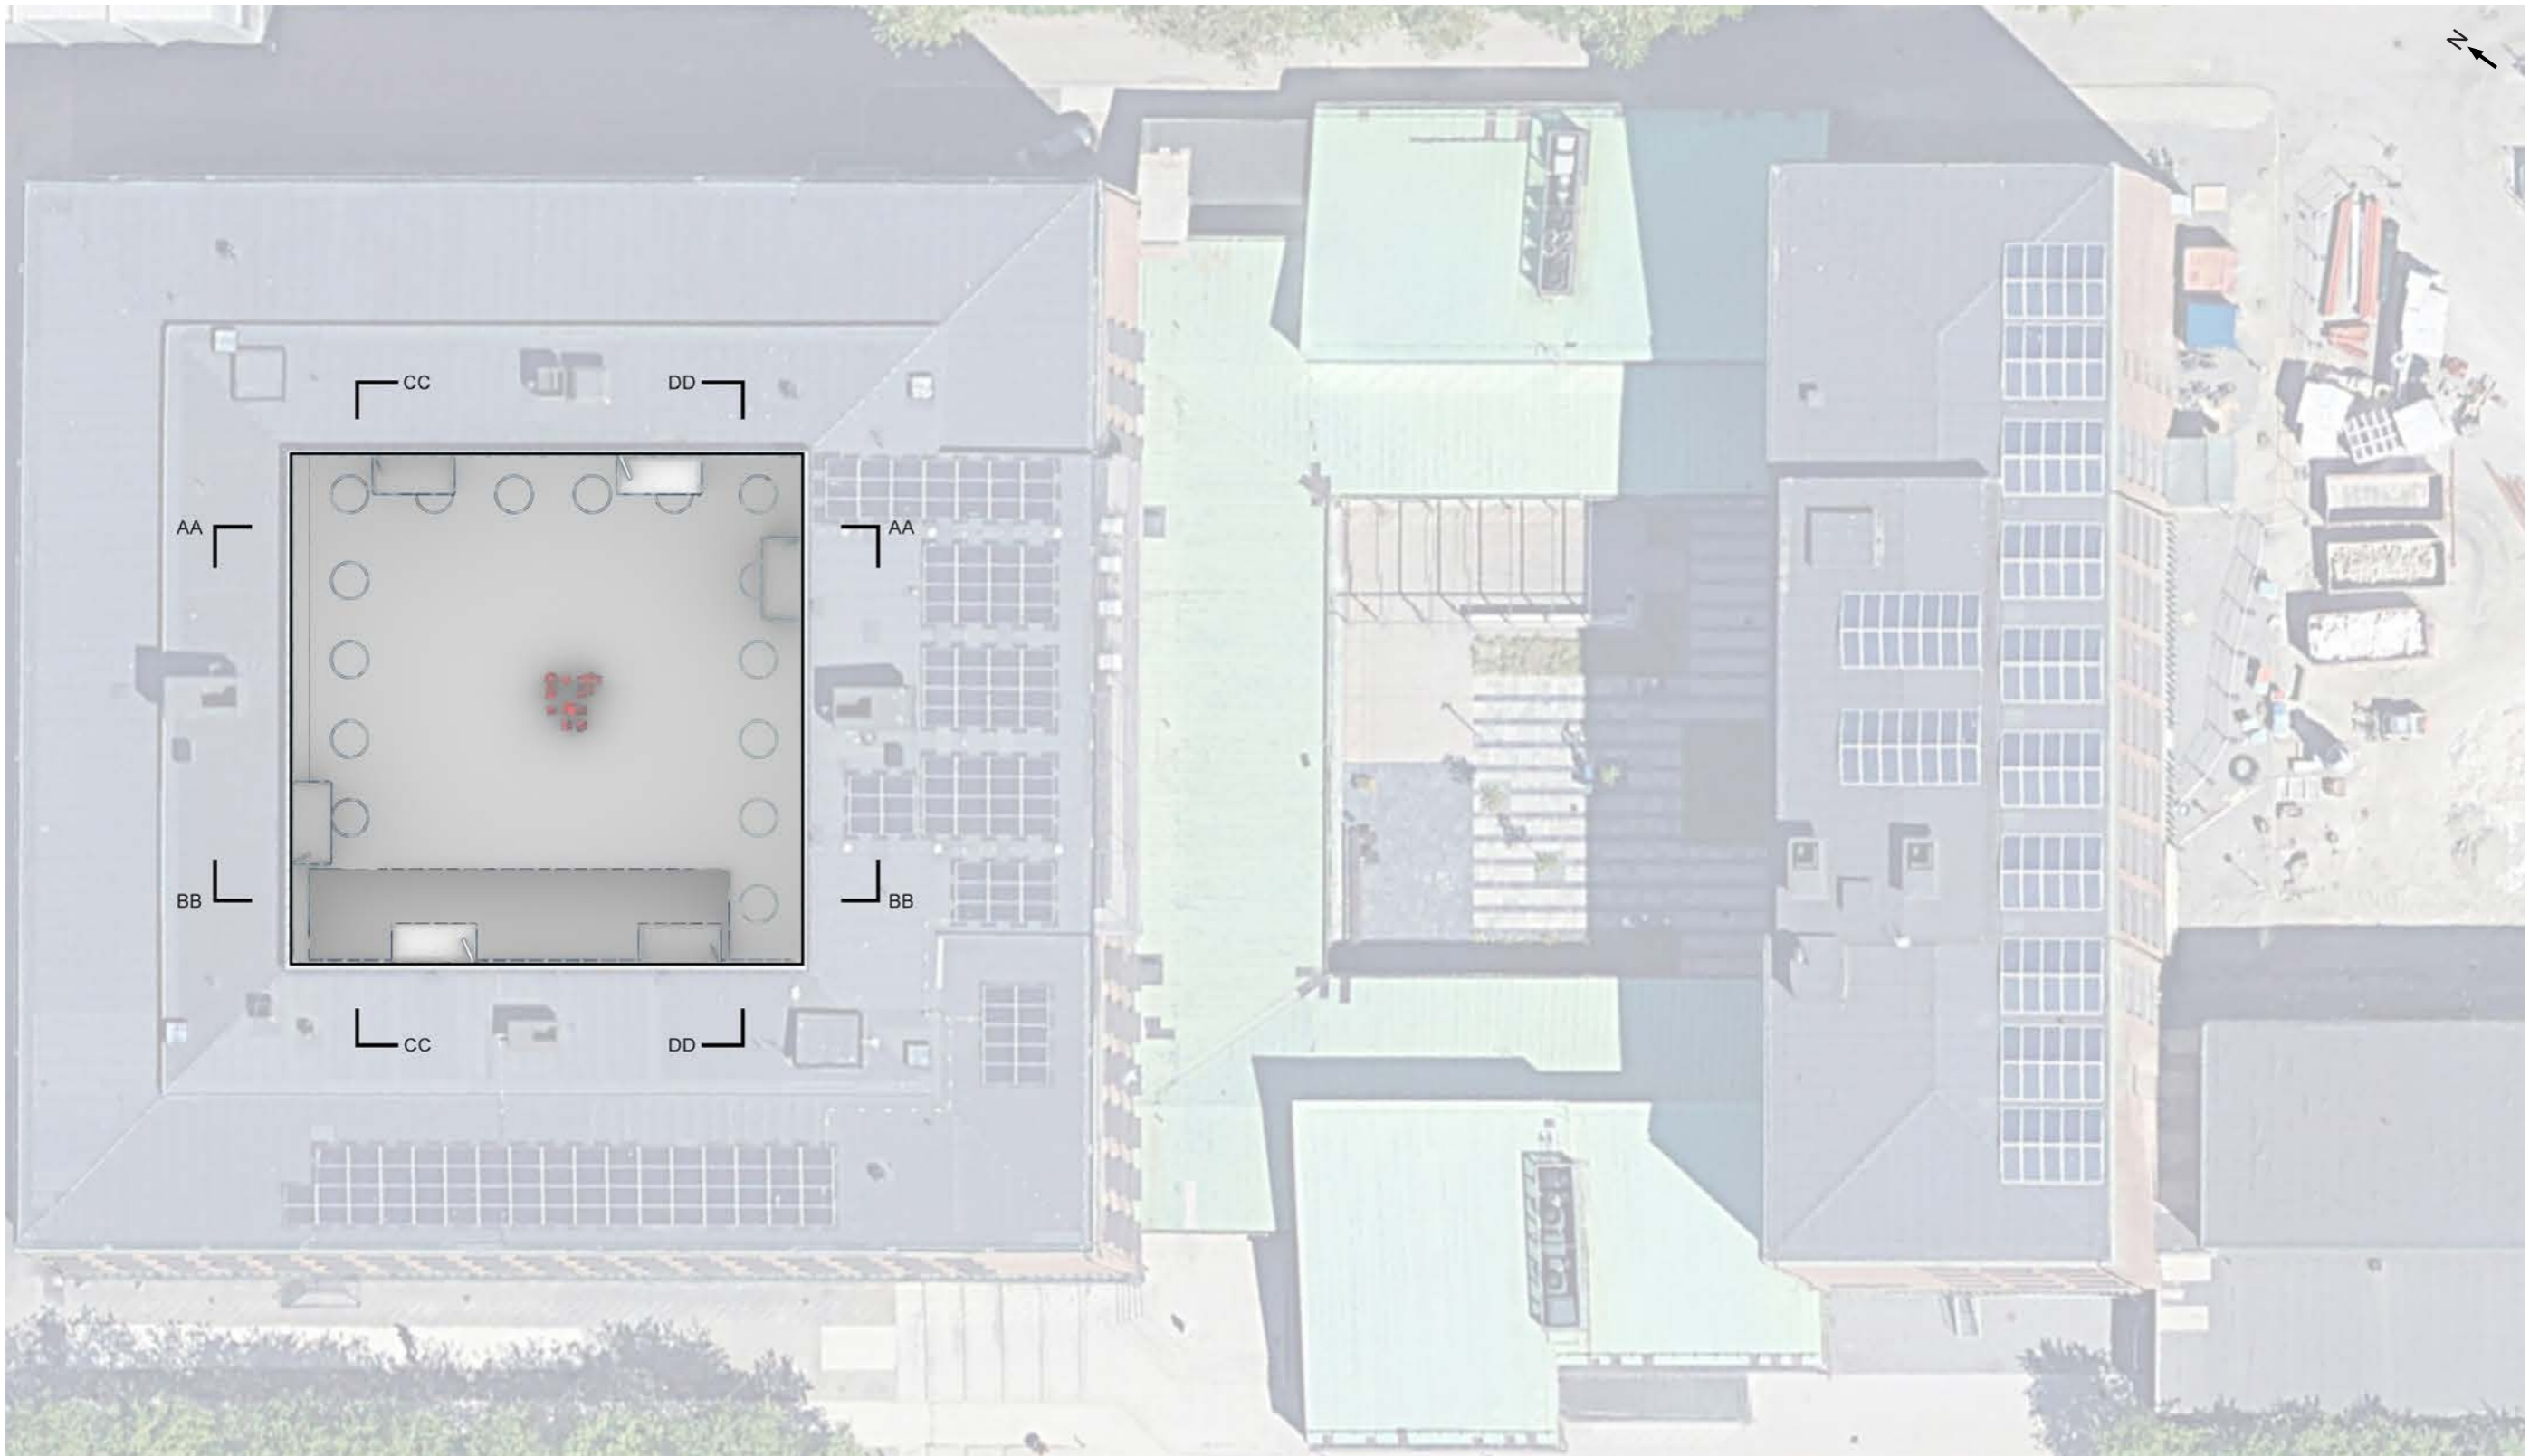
Site plan of the university campus with a visualisation of Installation one place into the atrium
